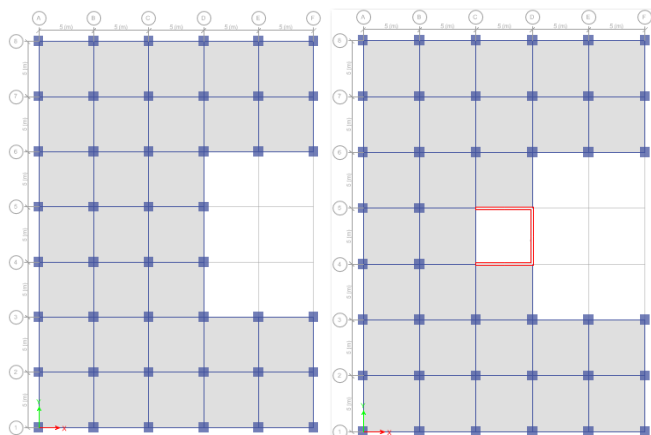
Plan of irregular buildings (without shear wall and with lift core shear wall)
